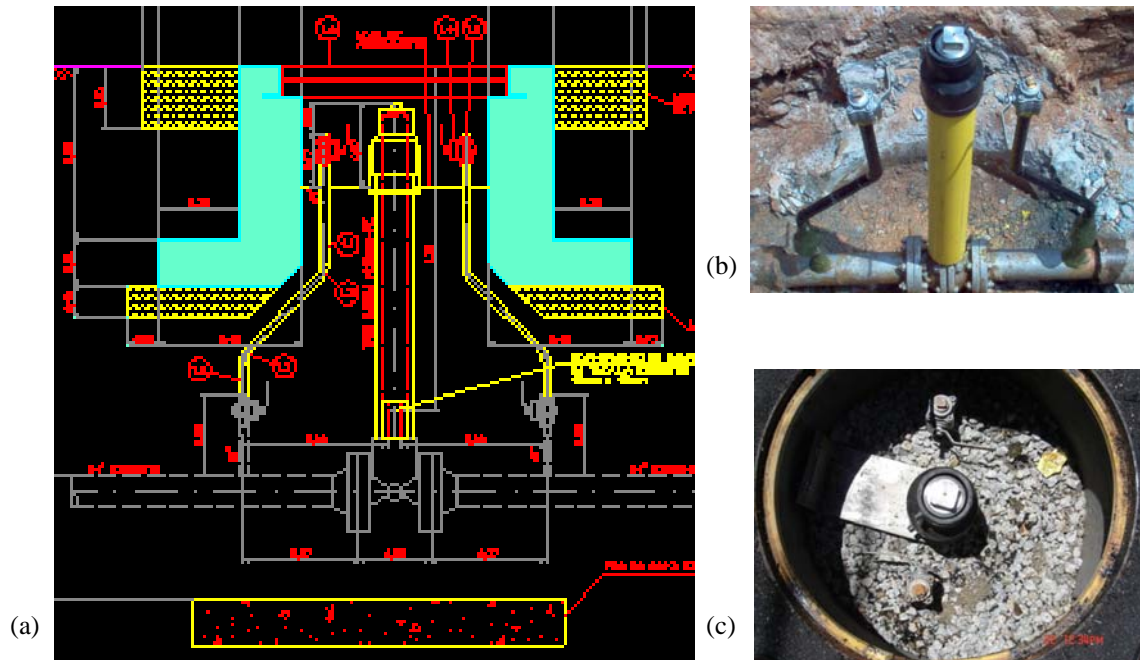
Work phases: (a) working drawing; (b) extension rod and blow off valve tubes in place; (c) the completed work
